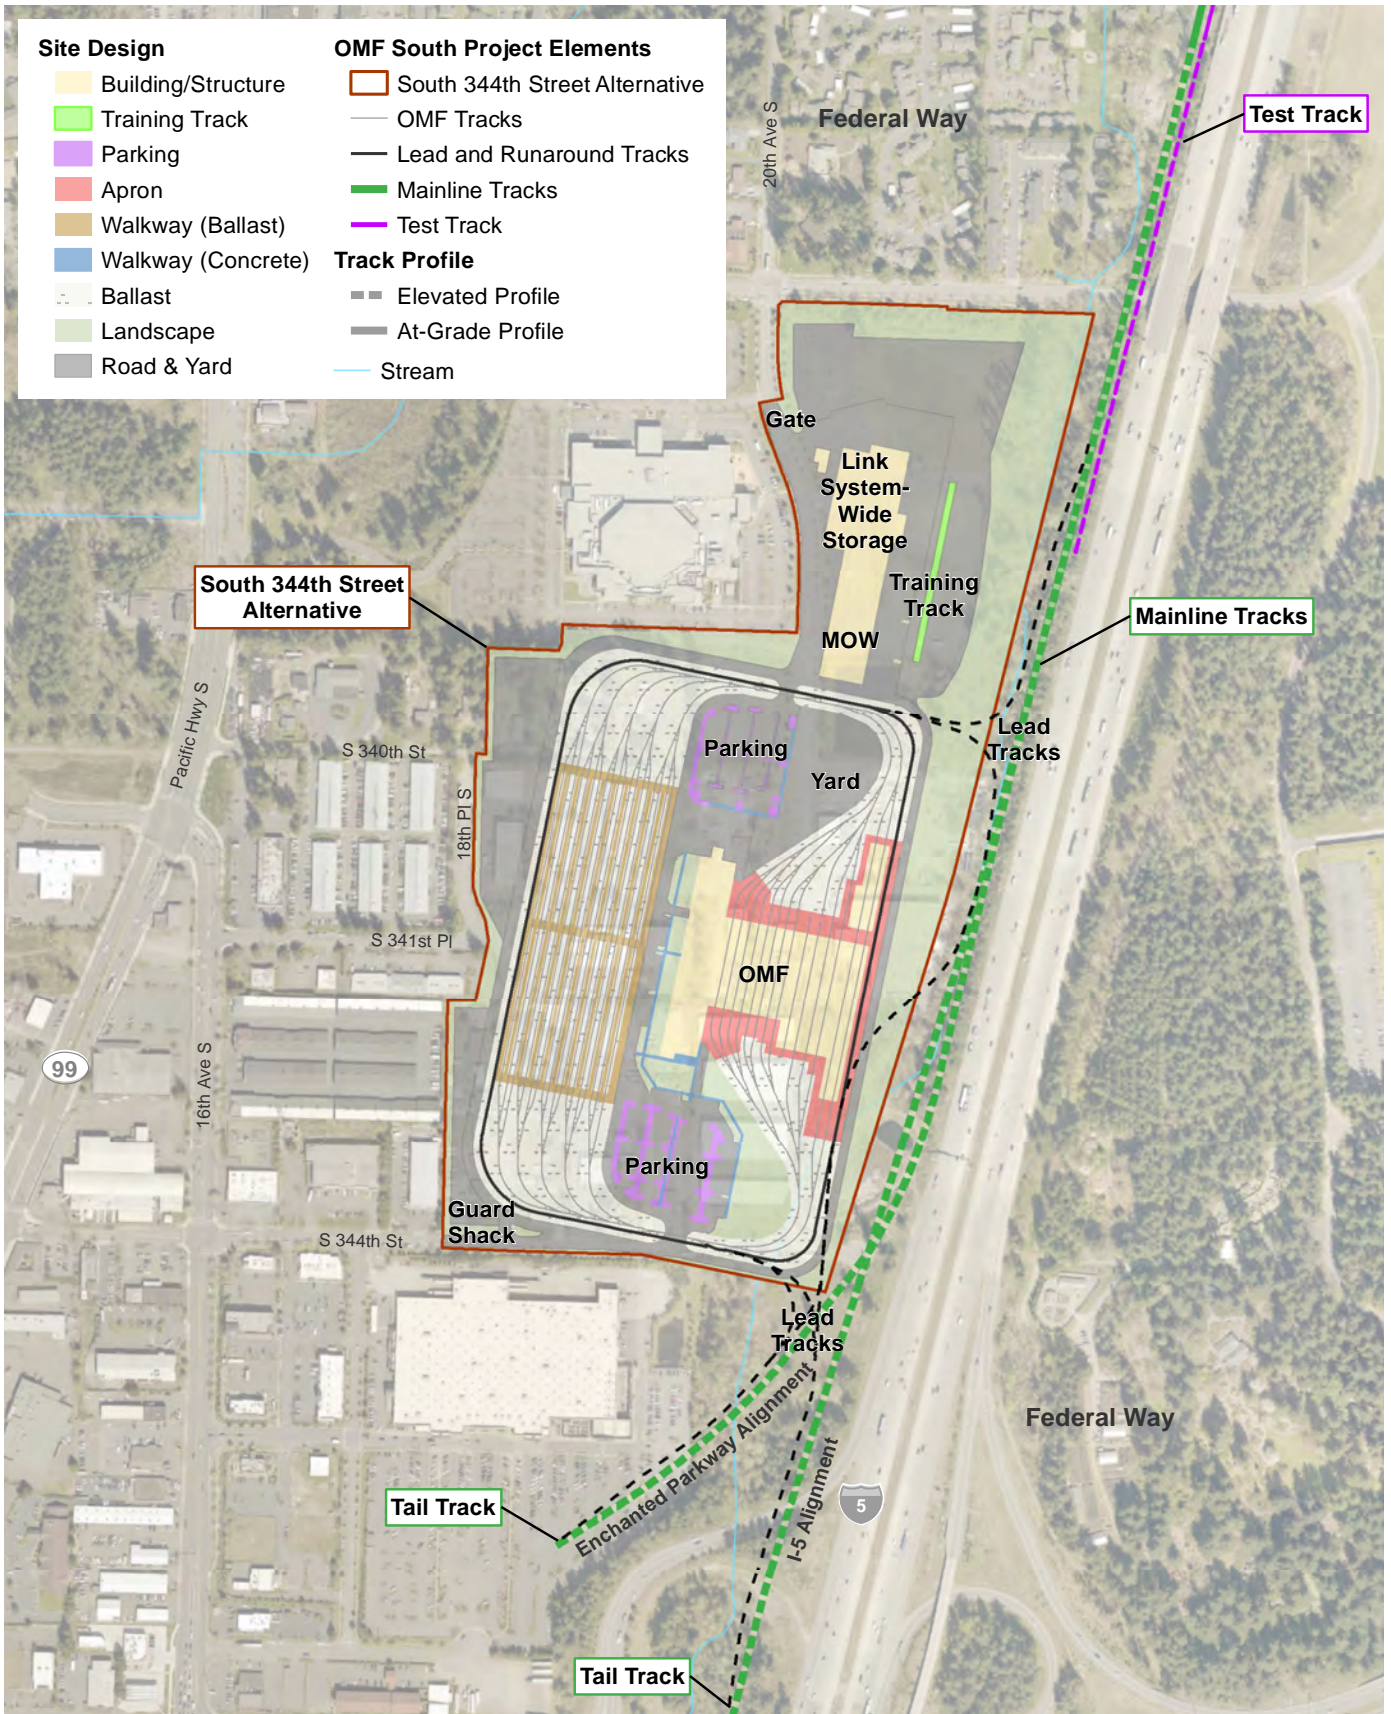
Conceptual Layout: South 344th Street Alternative
